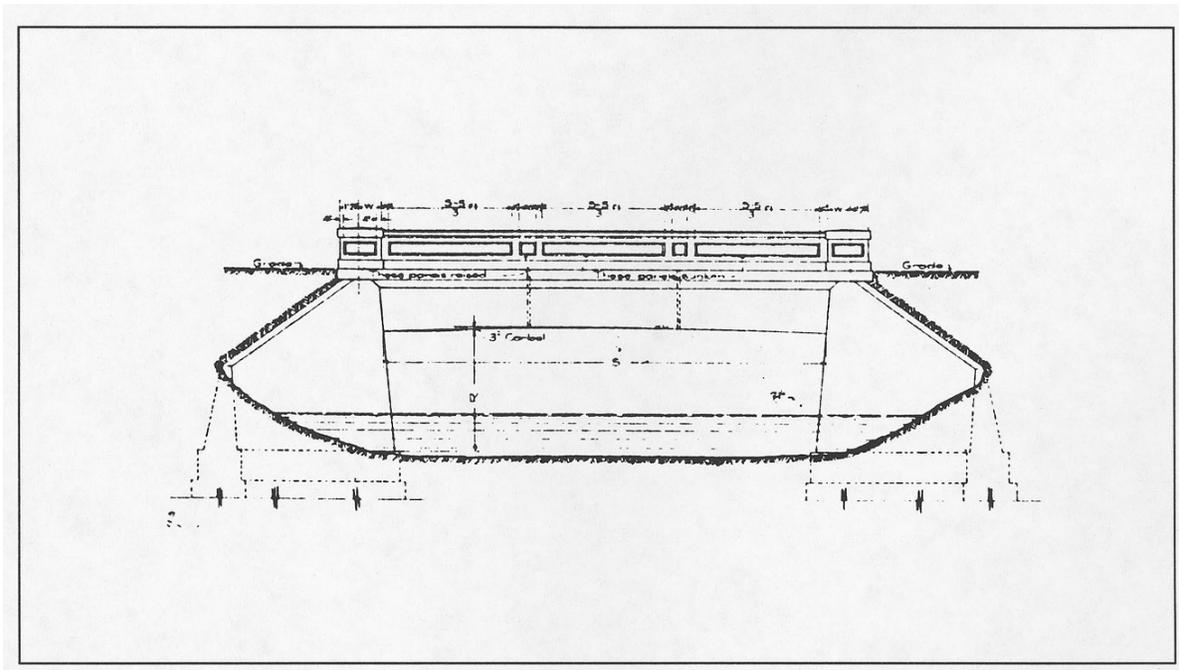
"Standard Girder Bridges, General Plan" from 1919 Standard Plans (Source: Maryland State Roads Commission 1919).
